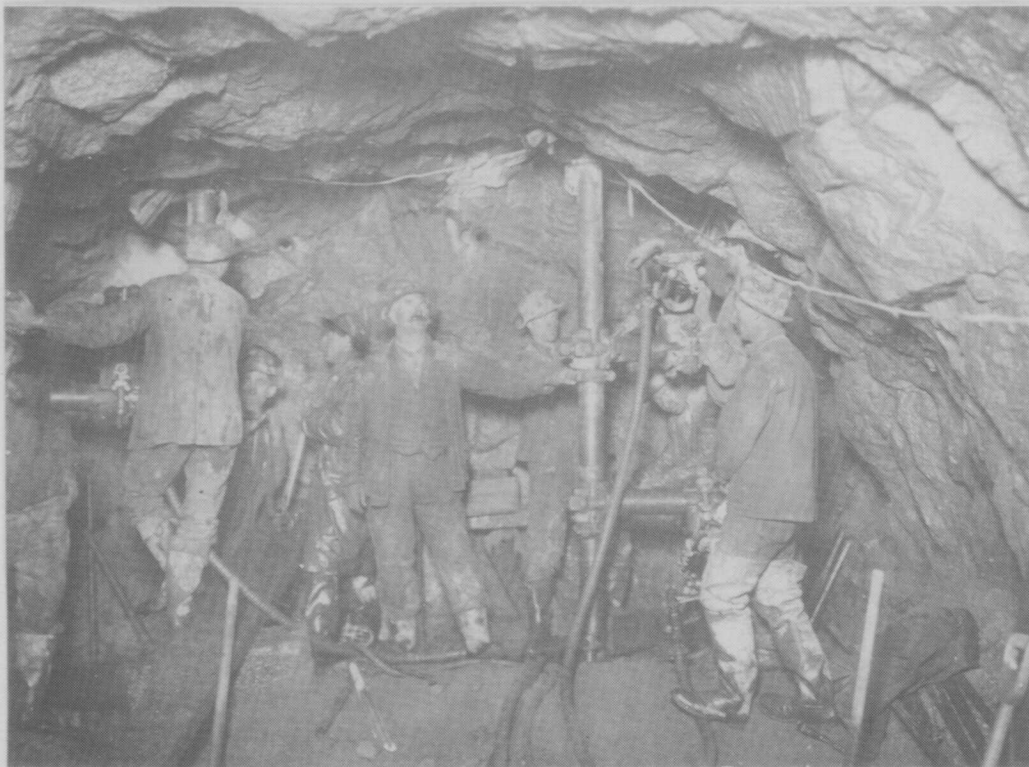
Work in Tunnel No. 1, 1913 (SCE var. [b]:Album 1, No. 298).
